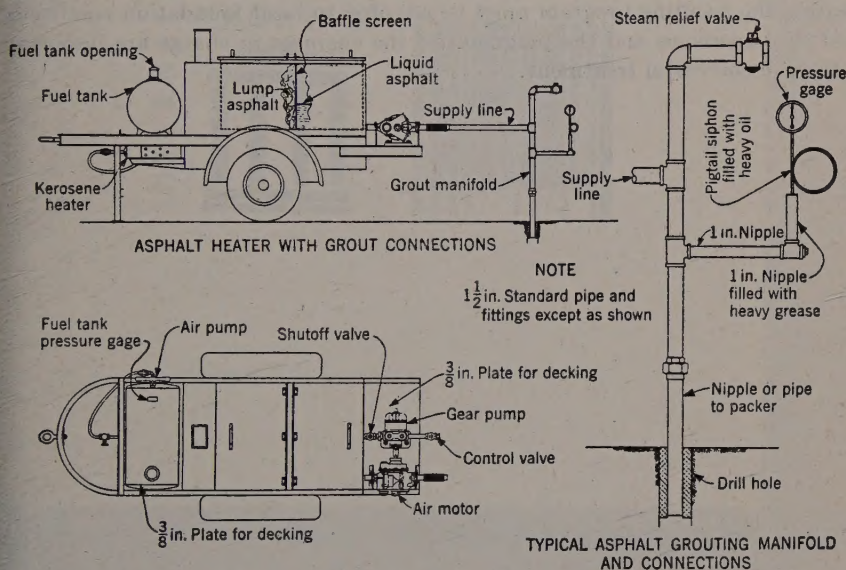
ASPHALT-GROUTING EQUIPMENT AND CONNECTIONS
